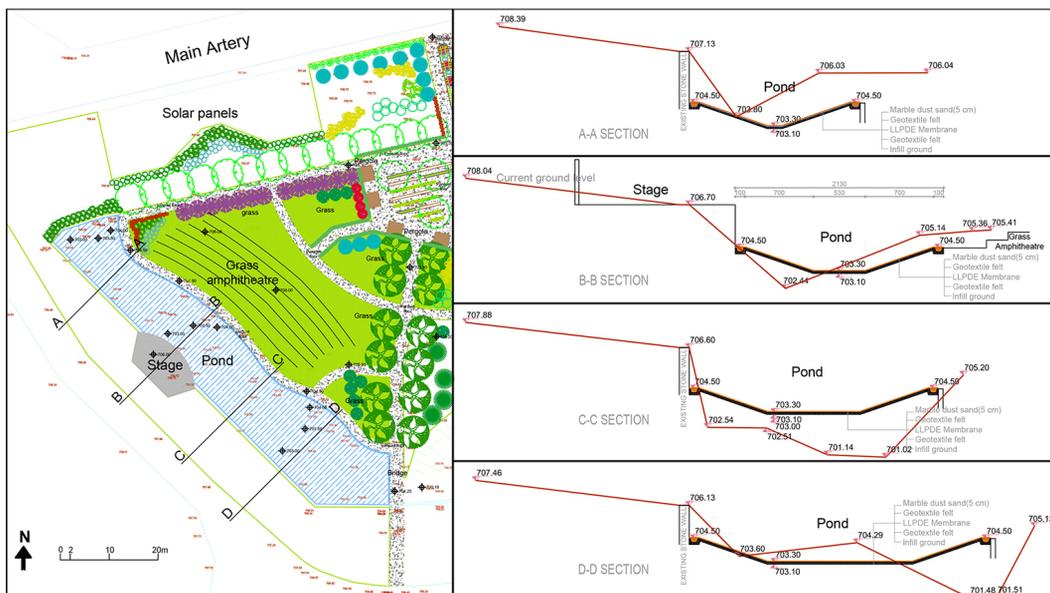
Plan of linear form pond and cross-sections of the pond floor
